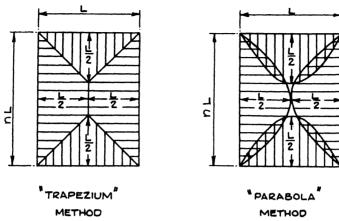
Distribution of Load to Beams supporting Slabs Spanning in Two Directions.
